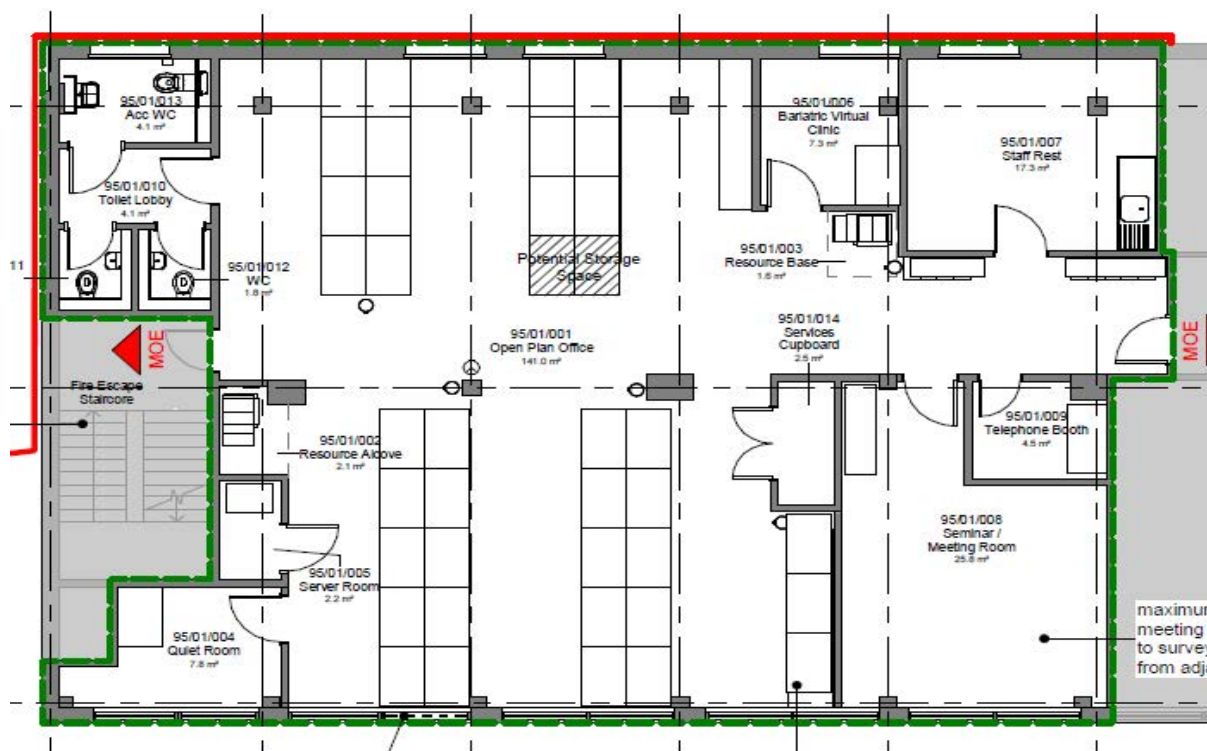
Proposed floorplan for office accommodation in Travelodge
